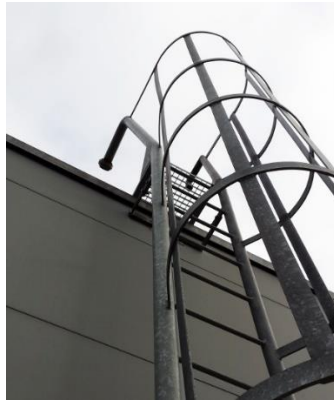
Dry riser mounted to ladder for roof access (Wuwejův zápisník, 2014)
